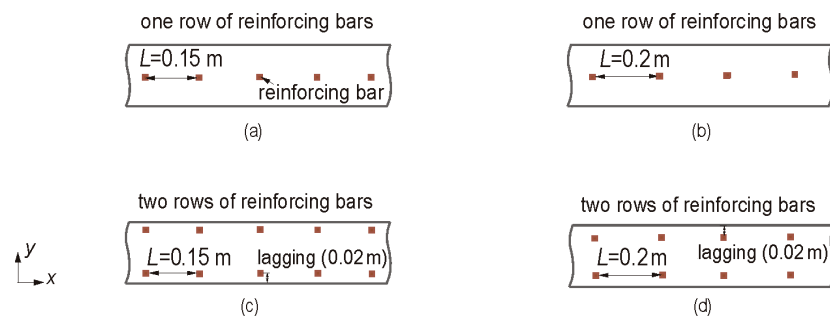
Variants of reinforced concrete walls: (a) 1b_L15, (b) 1b_L20, (c) 2b_L15, (d) 2b_L20.
